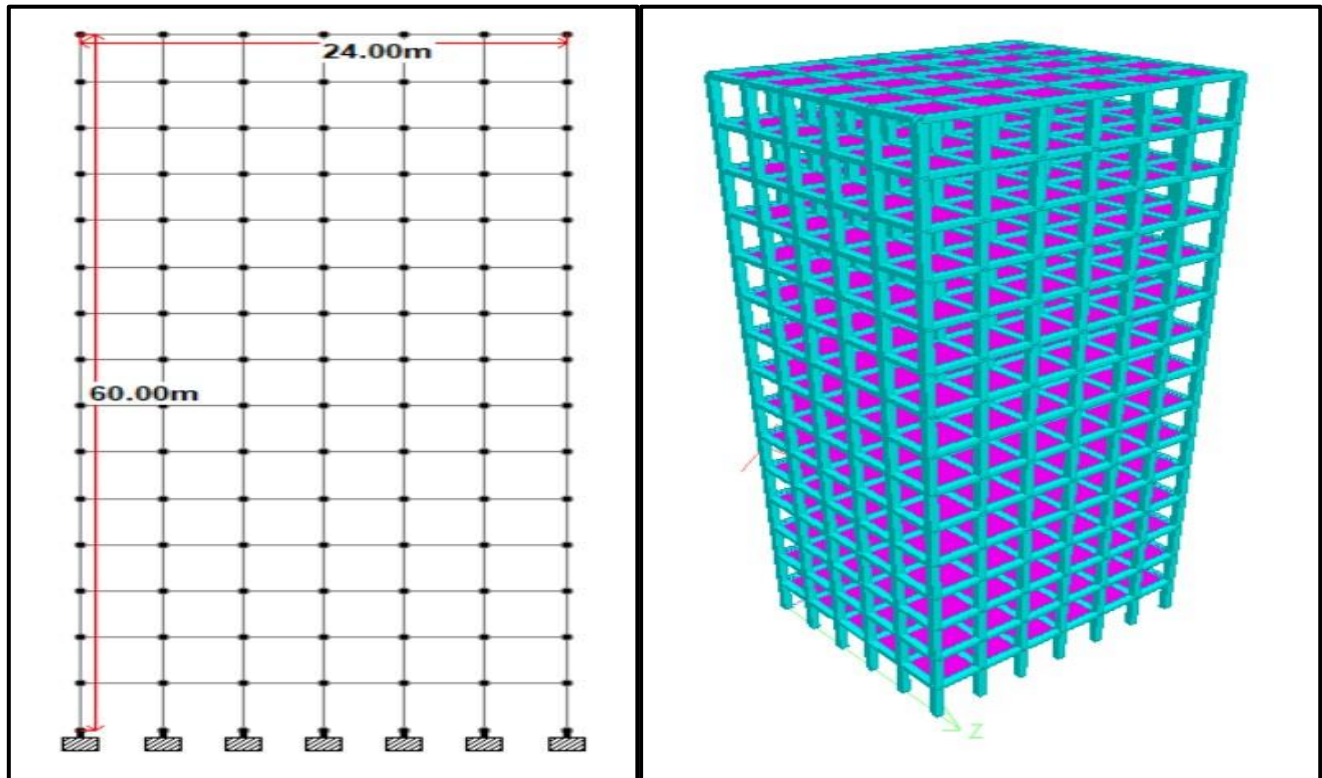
Elevation X & Z View of Building Frame & 3-D Rendered View Of unbraced frame
